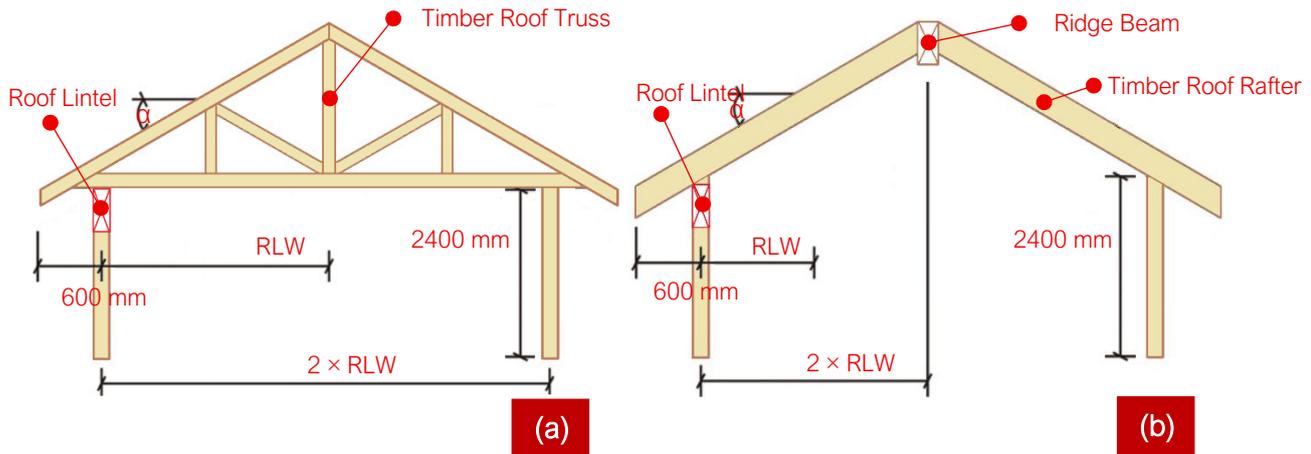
Red Stag Vertix₂₀ roof lintel beam; a) Timber roof truss, b) Timber roof rafter.
